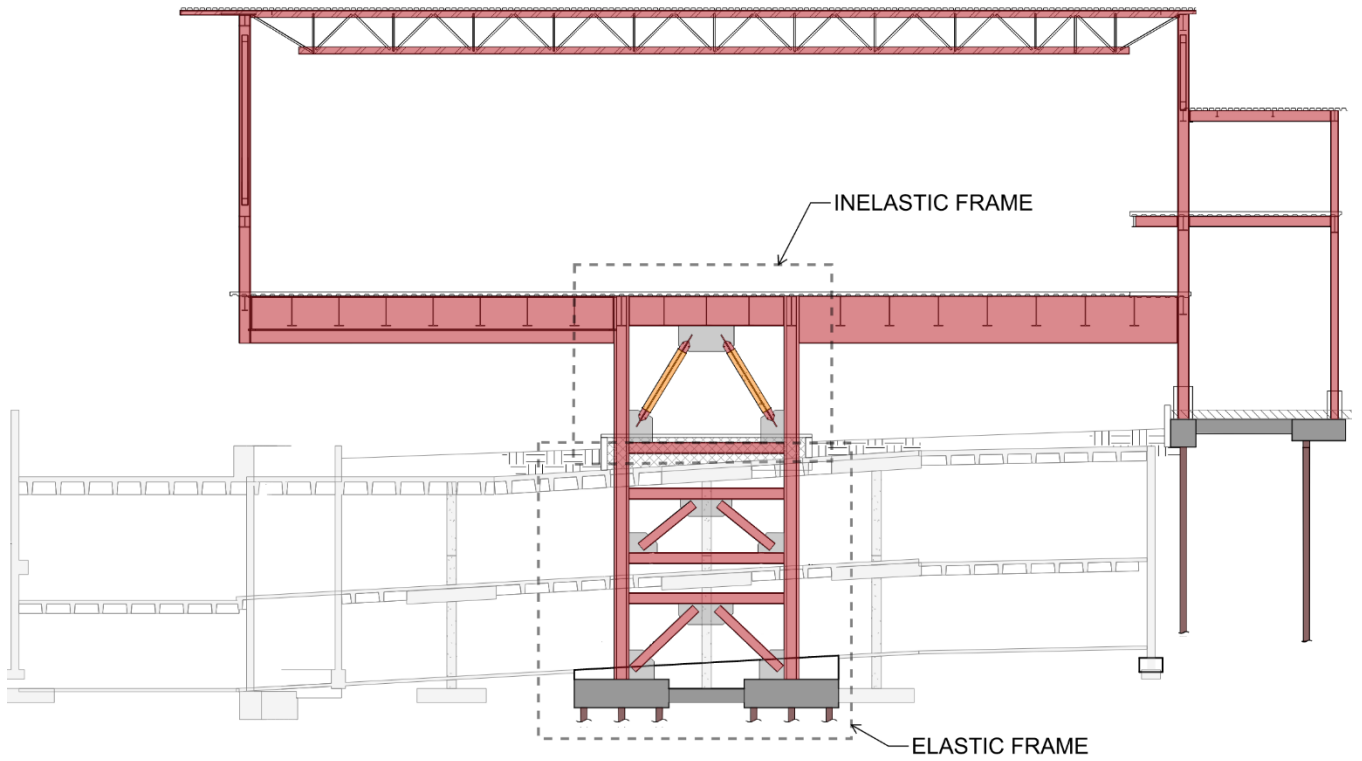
Elevation of Central (“North”) Frame that Penetrates Two Levels of Existing Parking Garage Below
